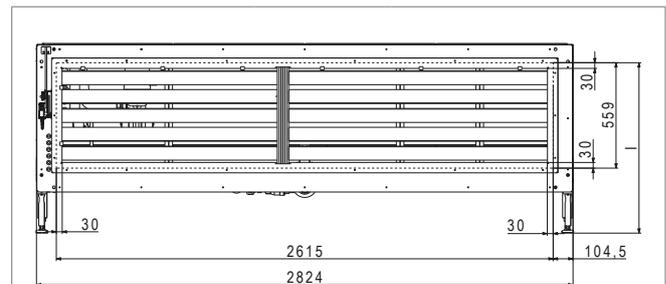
Dimensional drawing for extract air duct (dimensions in mm) (inspection opening for filter exchange)
